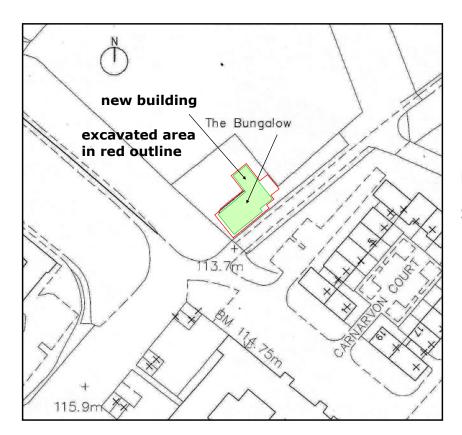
Detailed location plan of the new building at Bretby Hall Park, Derbyshire. Scale 1:1,250.
